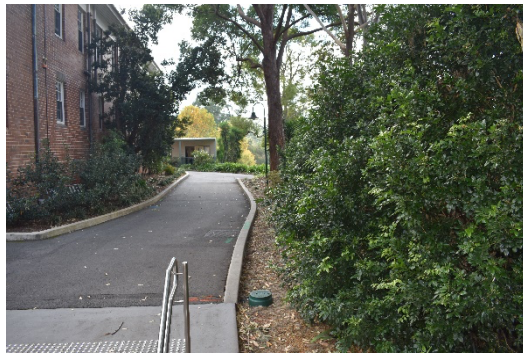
Electrical substation to be removed for construction of new building. Looking north west.
